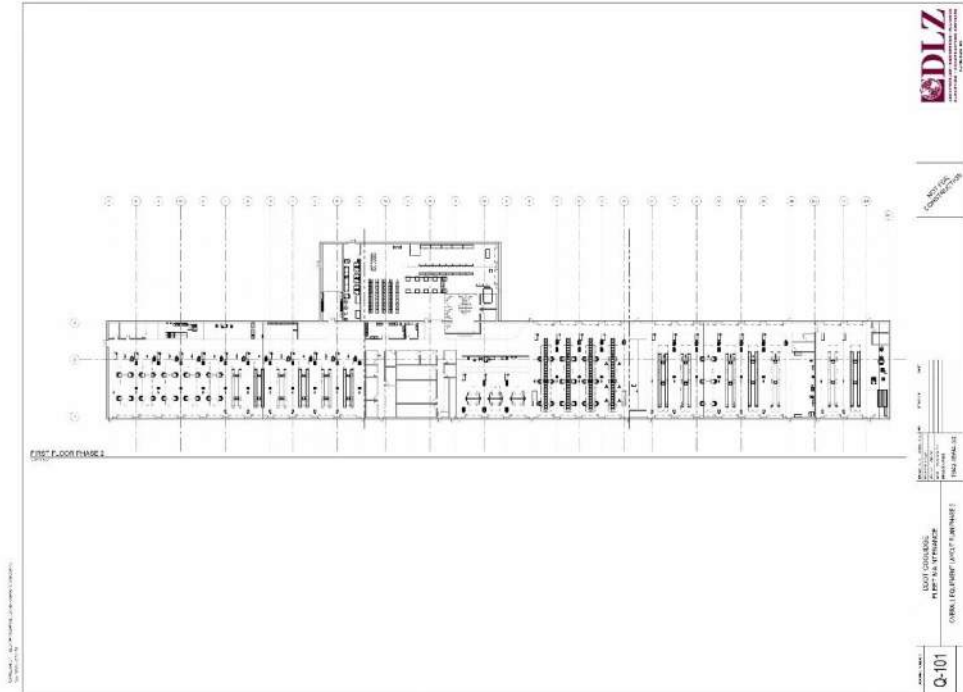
Fleet Maintenance LLWA Floor Plan
